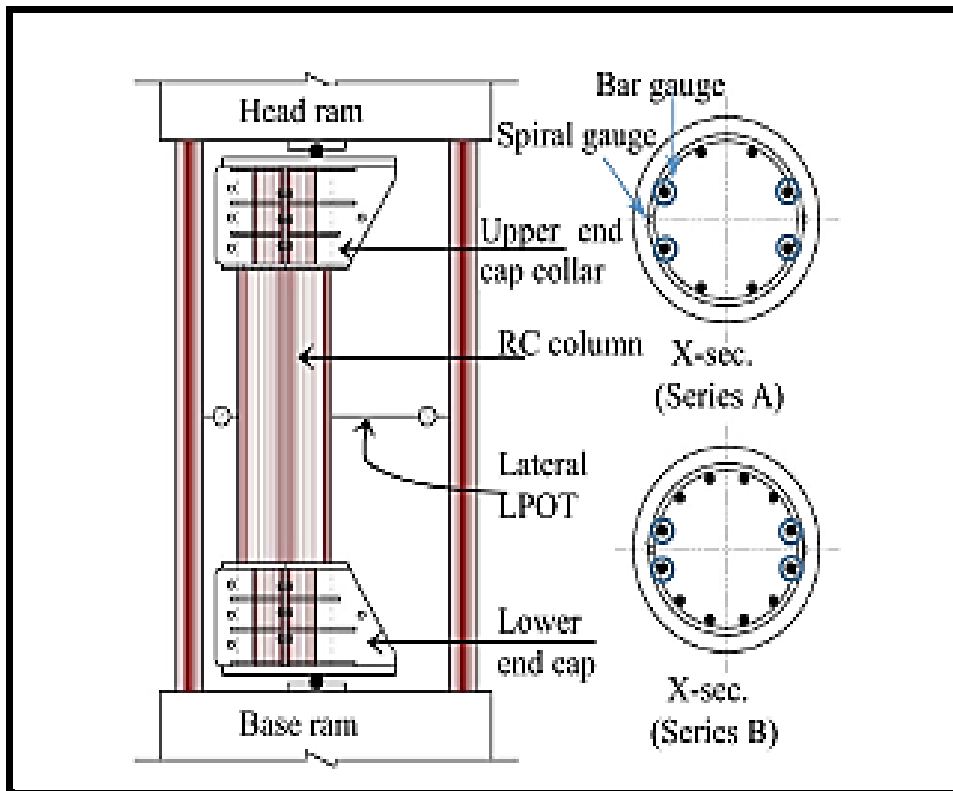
specimens testing for eccentrically loaded. (Hadhood et al. (2017))
